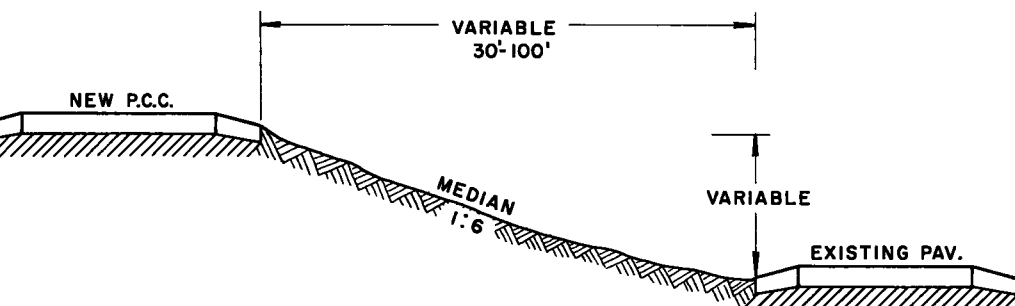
Cross-section—dust control test sections, road V-Mon-2-D.
